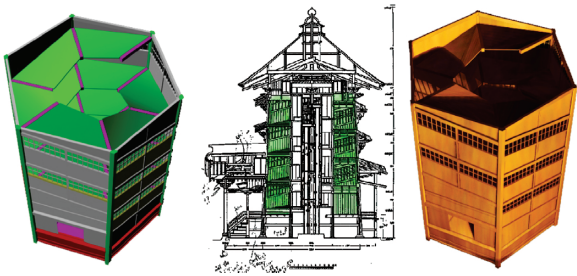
Exterior tower and double-helical interior walkway: (L) colorized; (M) diagram of the exterior tower's location; (R) rendered wood texture.
